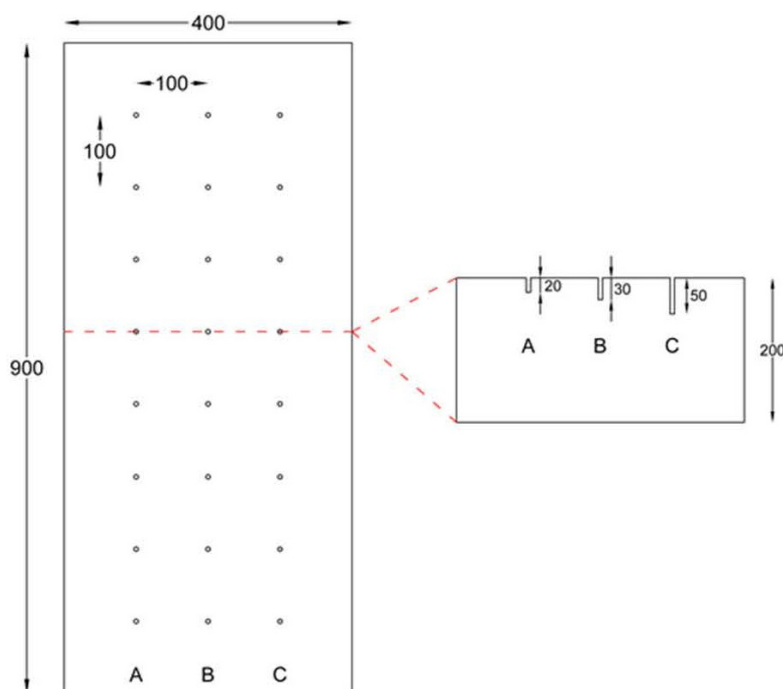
Plan and section of the first test site (measurements expressed in cm).
